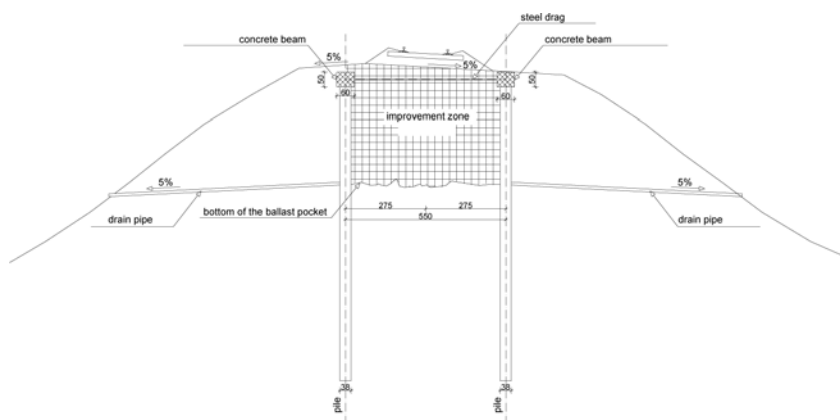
Cross section of the ballast pocket improvement measures on the embankment Donje Dubrave
